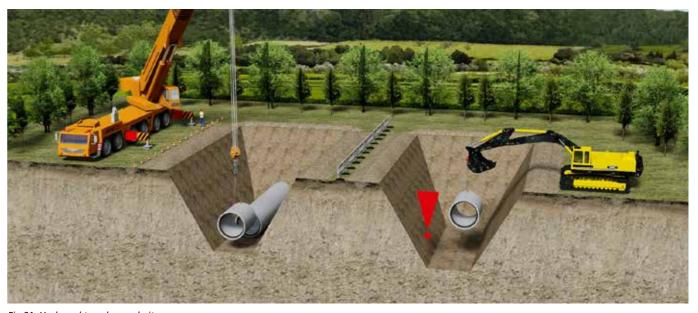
Unshored trenches and pits Construction machinery and vehicles up to 12.0 tonnes. At least 1.00 m between standing area and shoring edge Construction machinery and vehicles > 12.0 to 40.0 tonnes. At least 2.00 m between standing area and shoring edge
